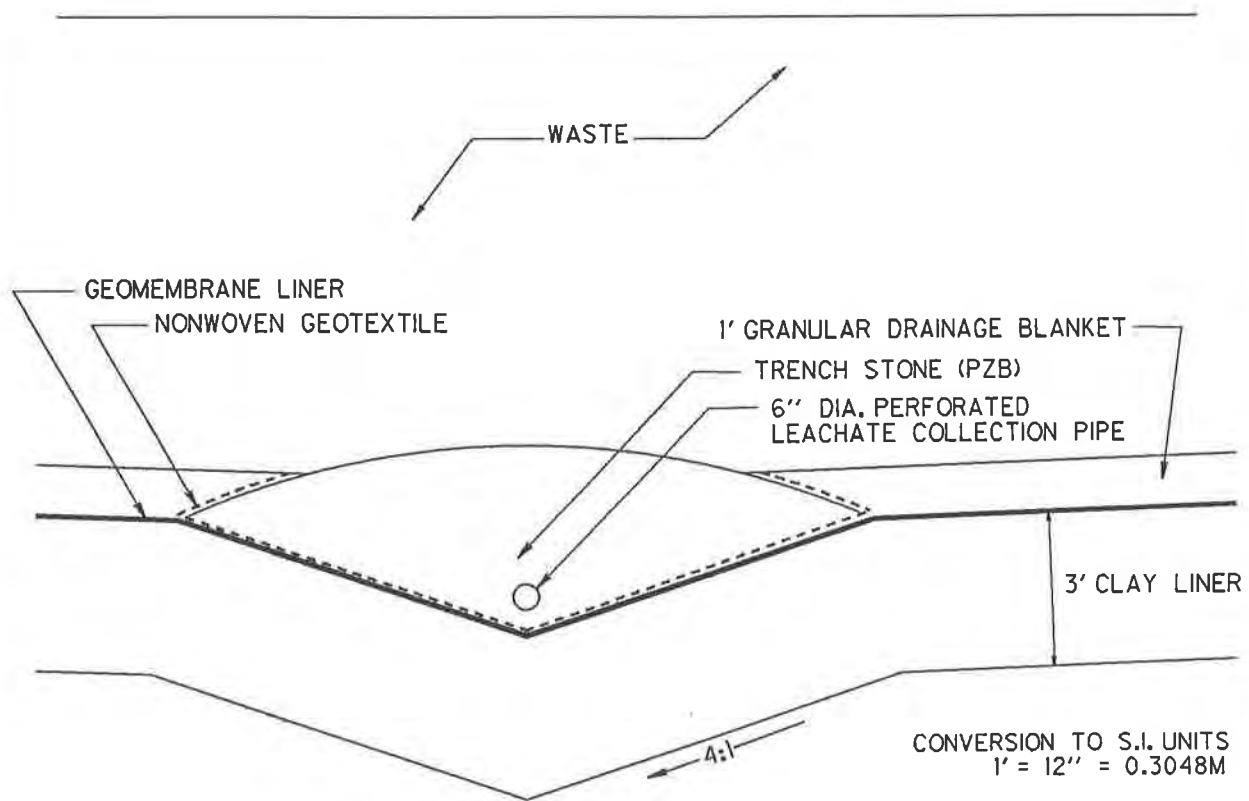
TYPICAL V-SHAPED TRENCH FOR LANDFILLS WITH COMPOSITE LINERS
